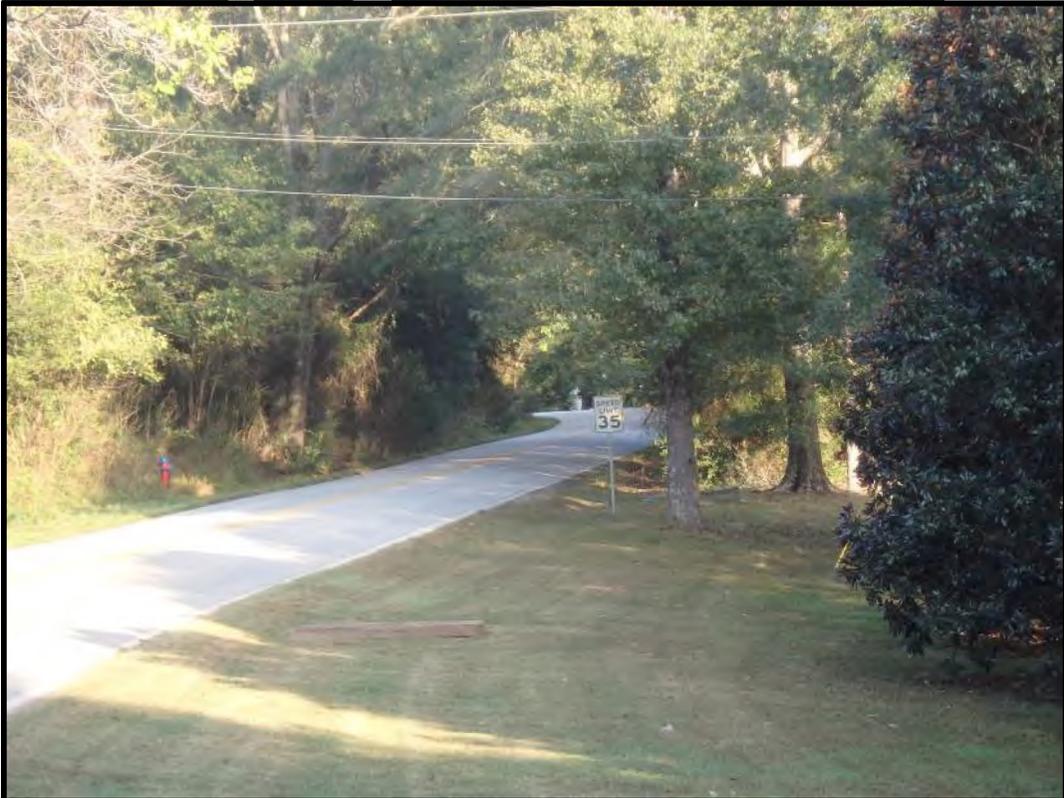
Buried drainage features east of Bagwell Farm Road intersection
